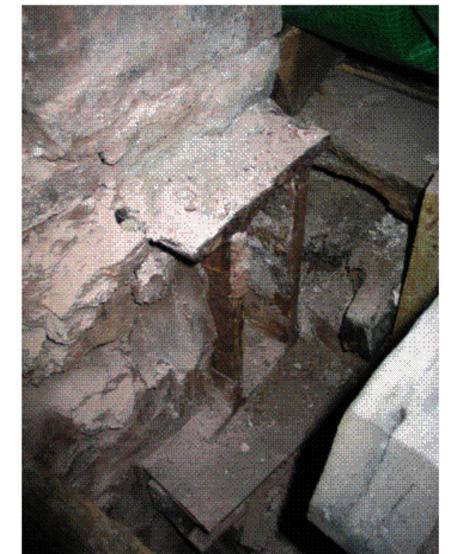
Wrought iron 'I' beams at south-east corner of Roof 'E', from the north-west.
